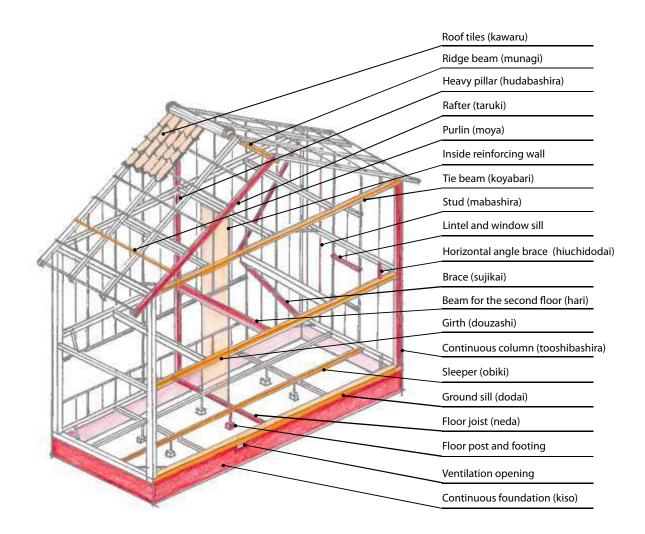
Post-and-beam wooden construction of a typical old wooden detached house. Credit: VANKOVA Kalina [32]
